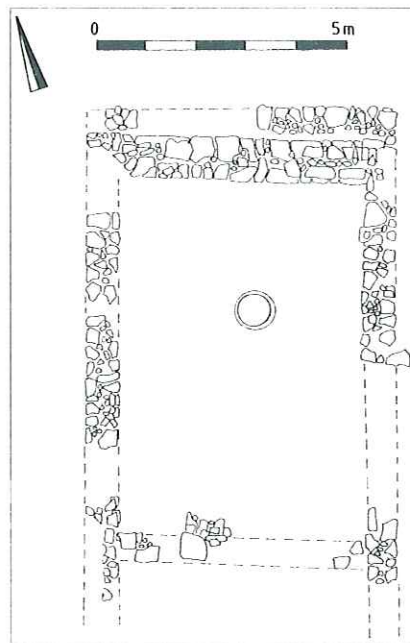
Miletus, plan of House A of the second building period (after Schiering 1979)
